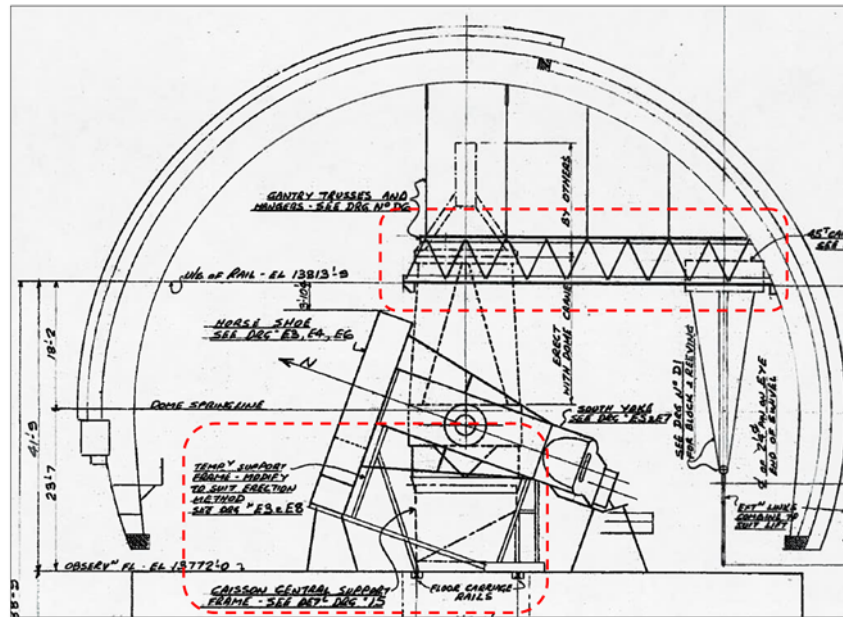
Excerpt of the original CFHT telescope structure erection drawing.
